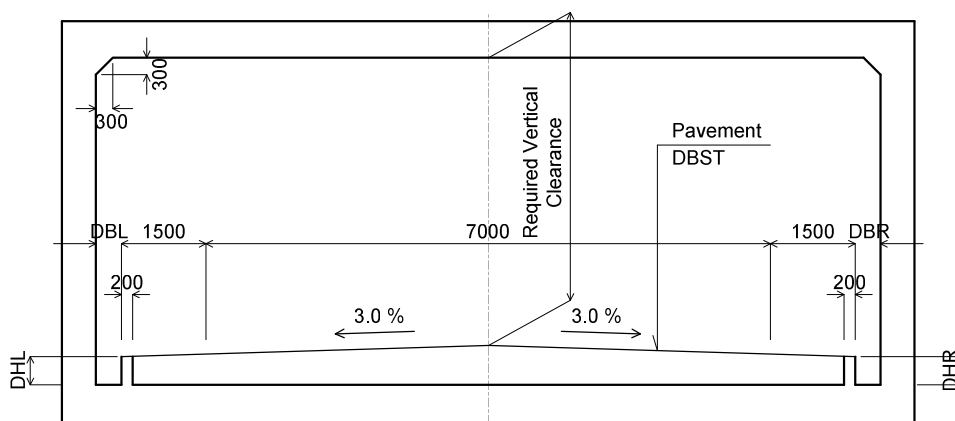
Detail of Box Culvert Internal Clearance for Class-C Road
